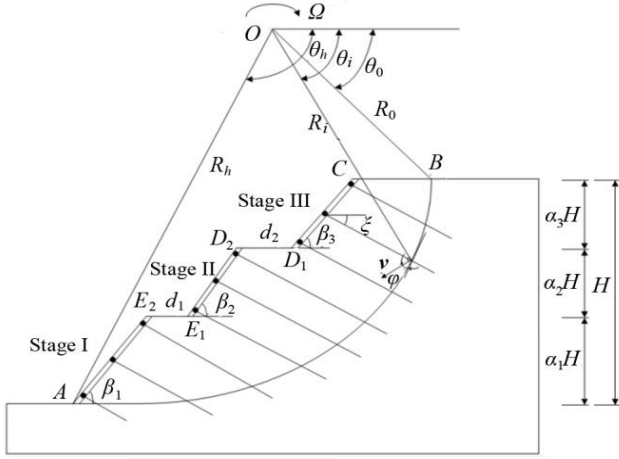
Failure mechanism of anchoring frame structure supporting a three-stage slope
